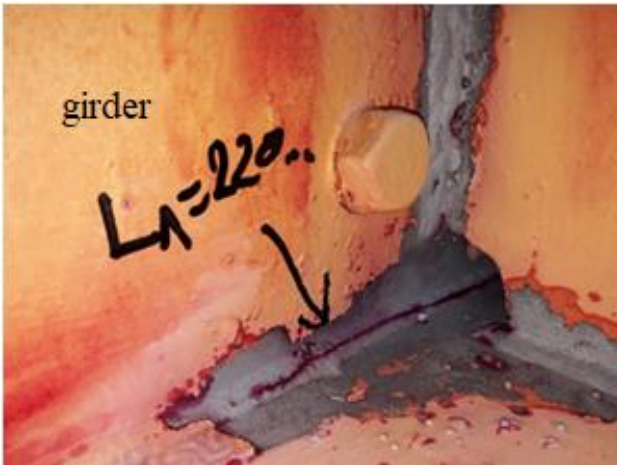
A fatigue crack in the weld metal of a steel girder under an orthotropic plate
